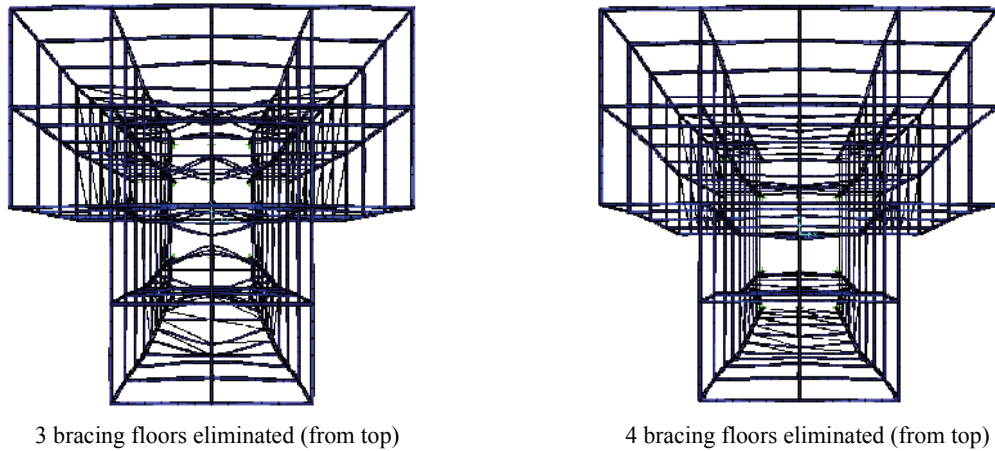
Plan view of the deformation of the 3D building frame for two bracing floors configurations, associated with first bracing scheme along weaker peripheral frames
